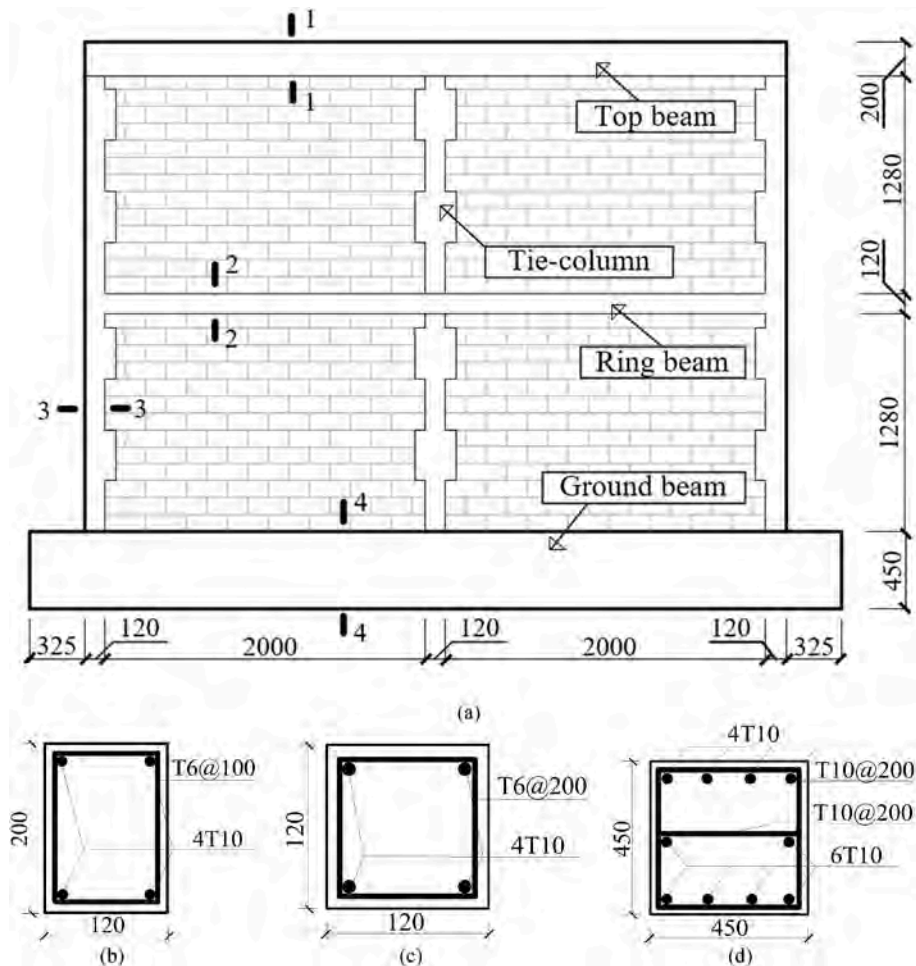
Geometric dimensions and detailing of the specimen W1 (unit: mm): (a) Overall scheme; (b) Section 1-1; (c) Section 2-2(3-3); (d) Section 4-4.
